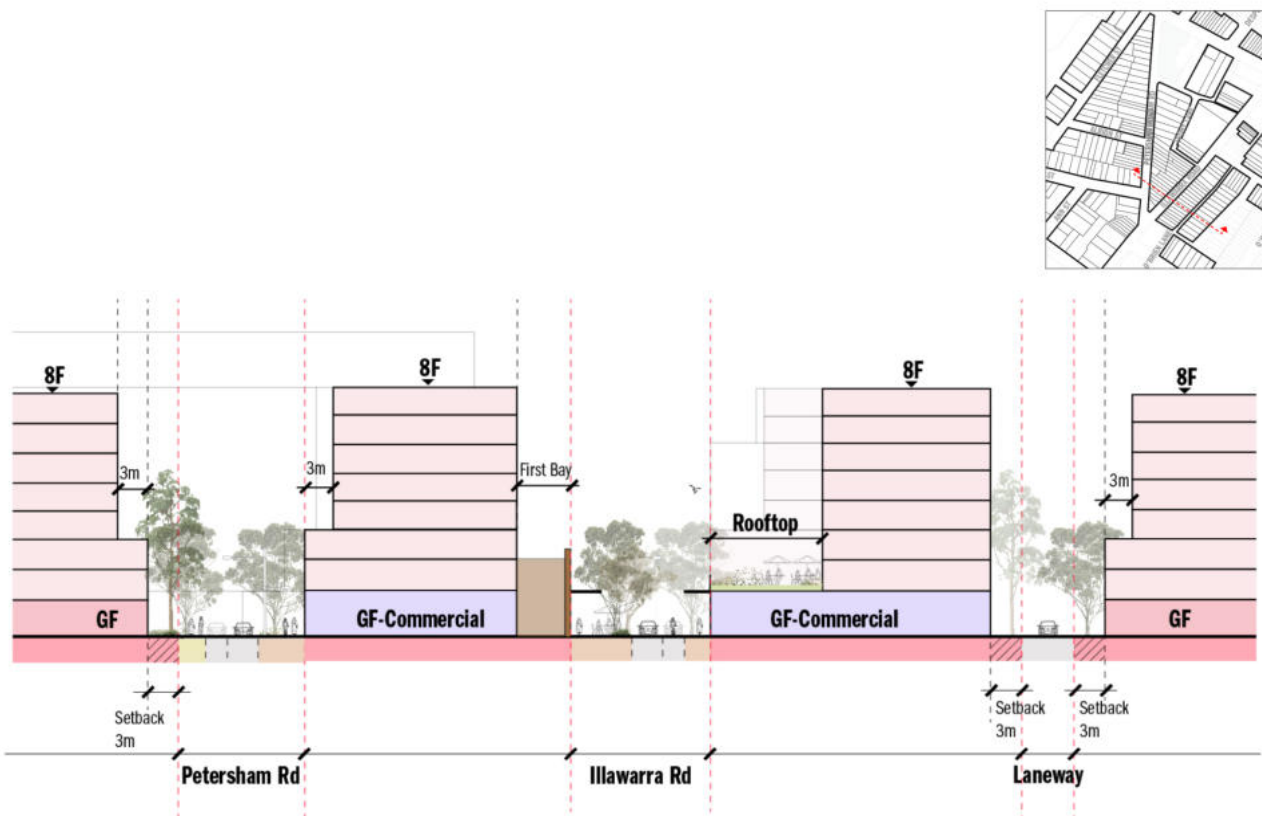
Marrickville Local Centre – Illawarra Road to Petersham Road Section
